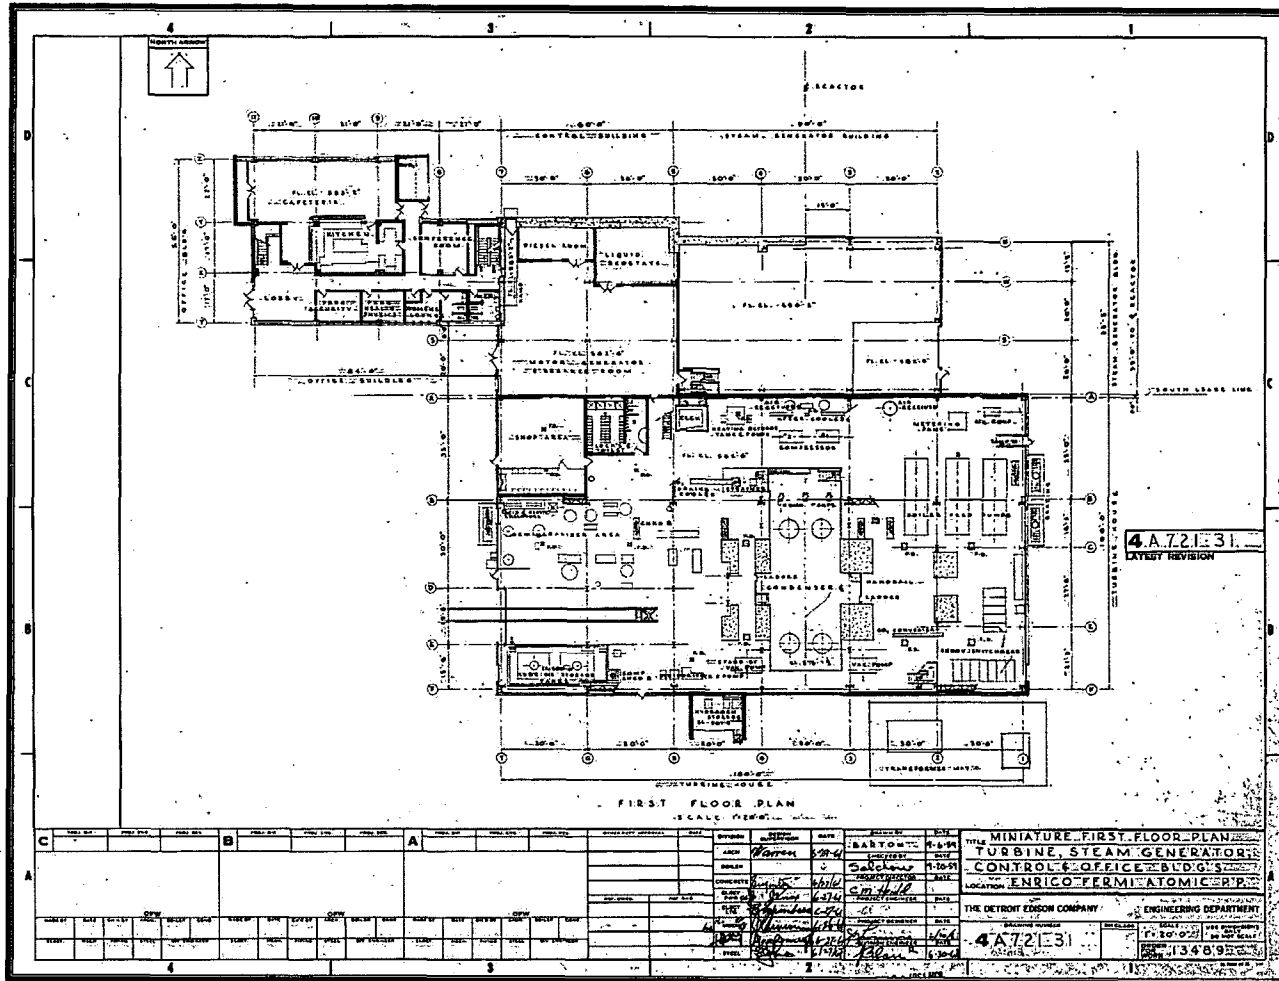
First floor plan of turbine, control room, office, and steam generator buildings (Courtesy DECo)
